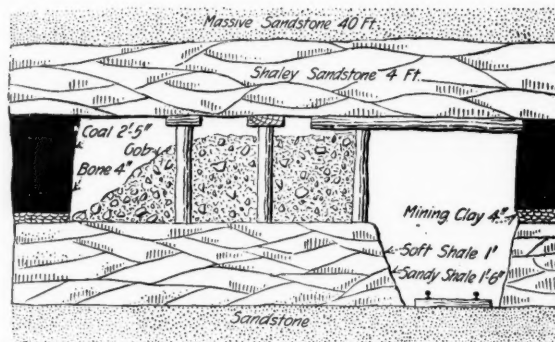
CROSS-SECTION OF ROOM IN THIN SEAM
